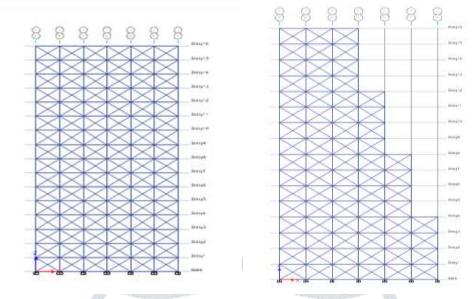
Elevation of regular building Fig.3.3:Elevation of irregular building
